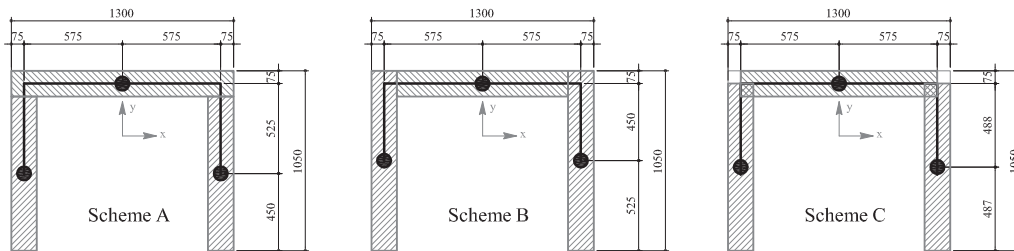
TUA: Different schemes for subdividing the U-shaped section into planar wall sections (all dimensions are in millimetres).
